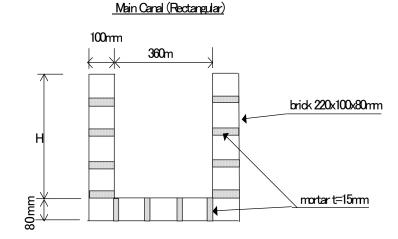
Standard Cross Section of Canal (B=0.34m, Rectangular)
